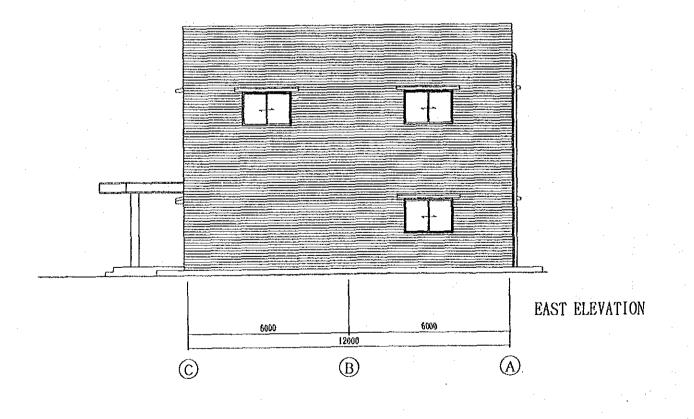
Radar Operations Building Section / Elevation (1)
